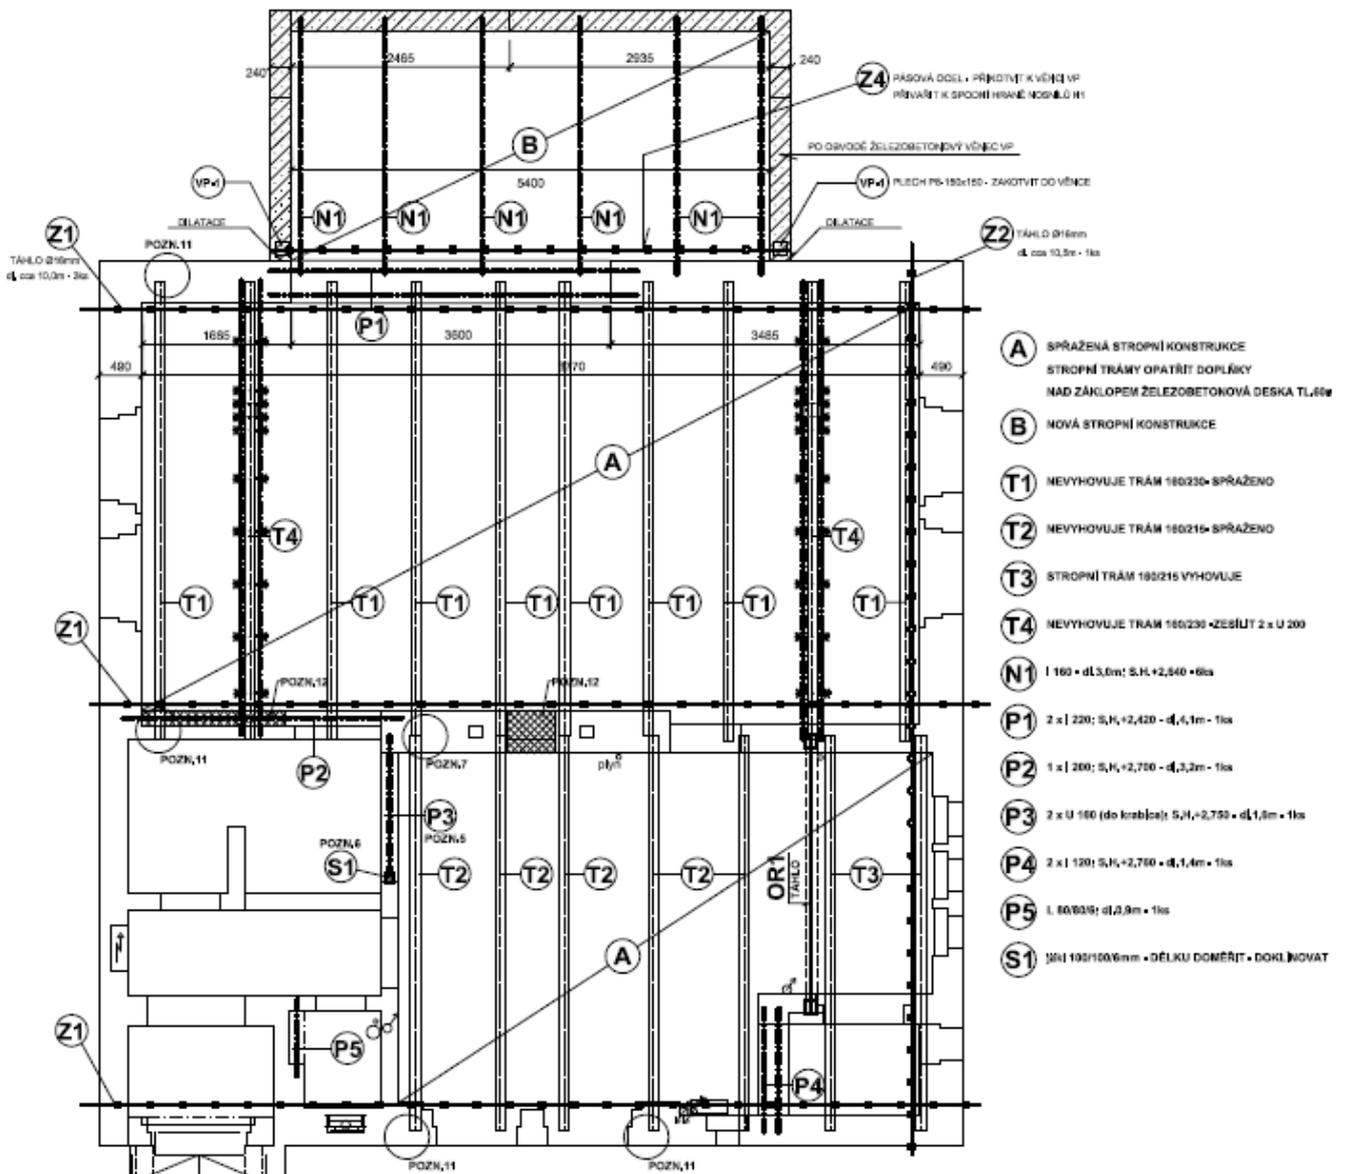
proposed changes of the ceiling above the ground floor and on the ground floor
